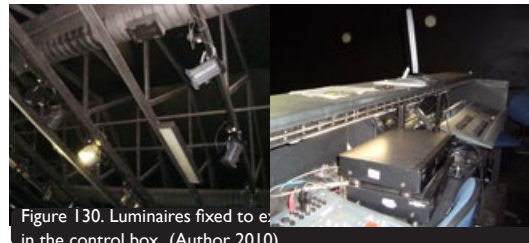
Luminaires fixed to exposed wooden roof trusses in the control box (Author, 2010).
